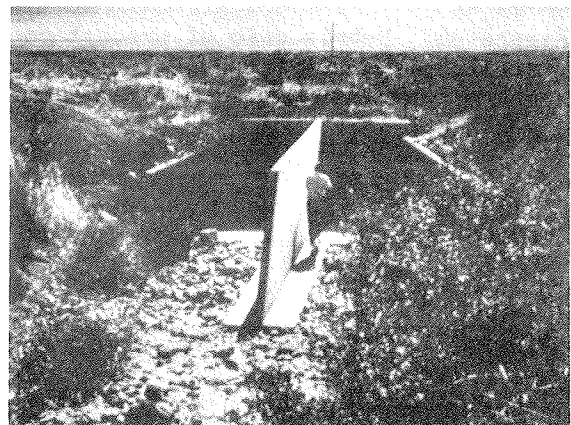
Concrete debris fin with rounded vertical leading edge as extension of culvert center wall.
